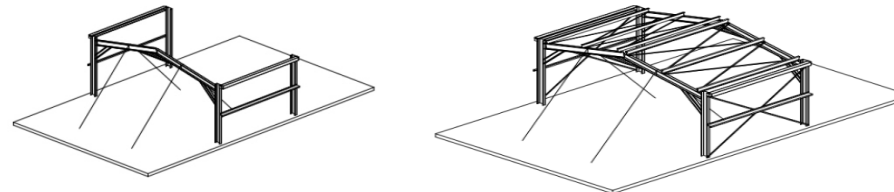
Frame First Temporary Bracing on First Rafter Installed Fig 2. Temporary Bracing Installed as X Bracing
